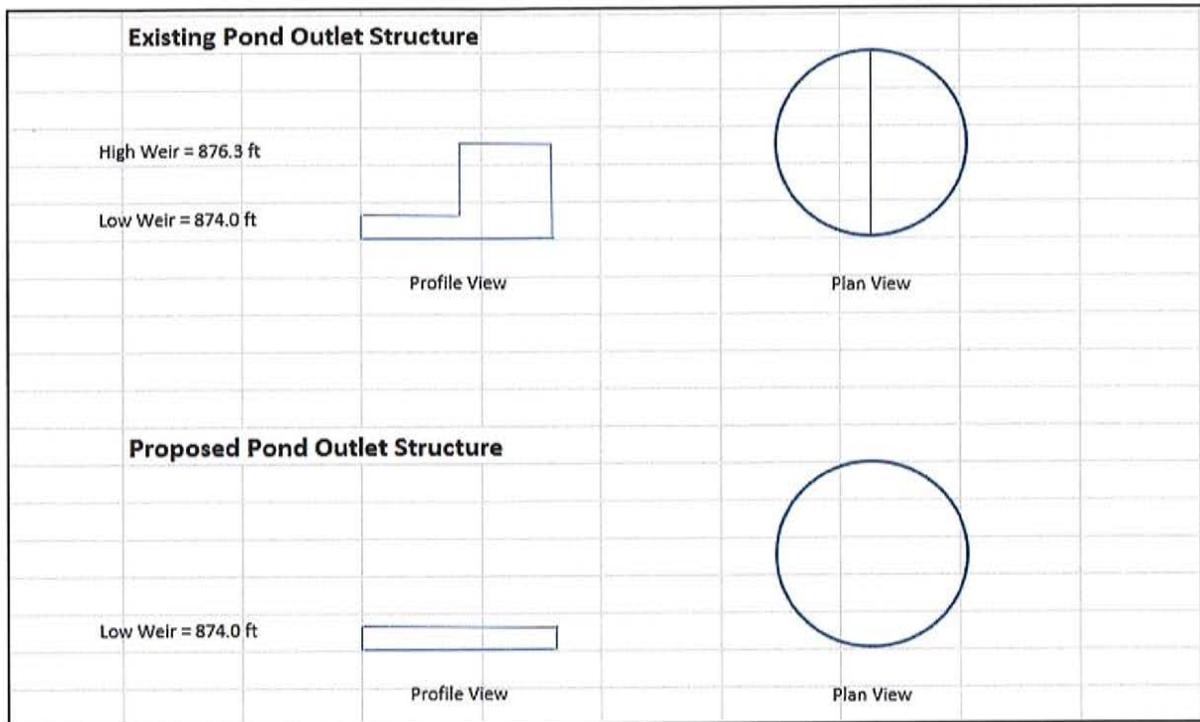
Alternative 2, Modify Lake Outlet Structure
